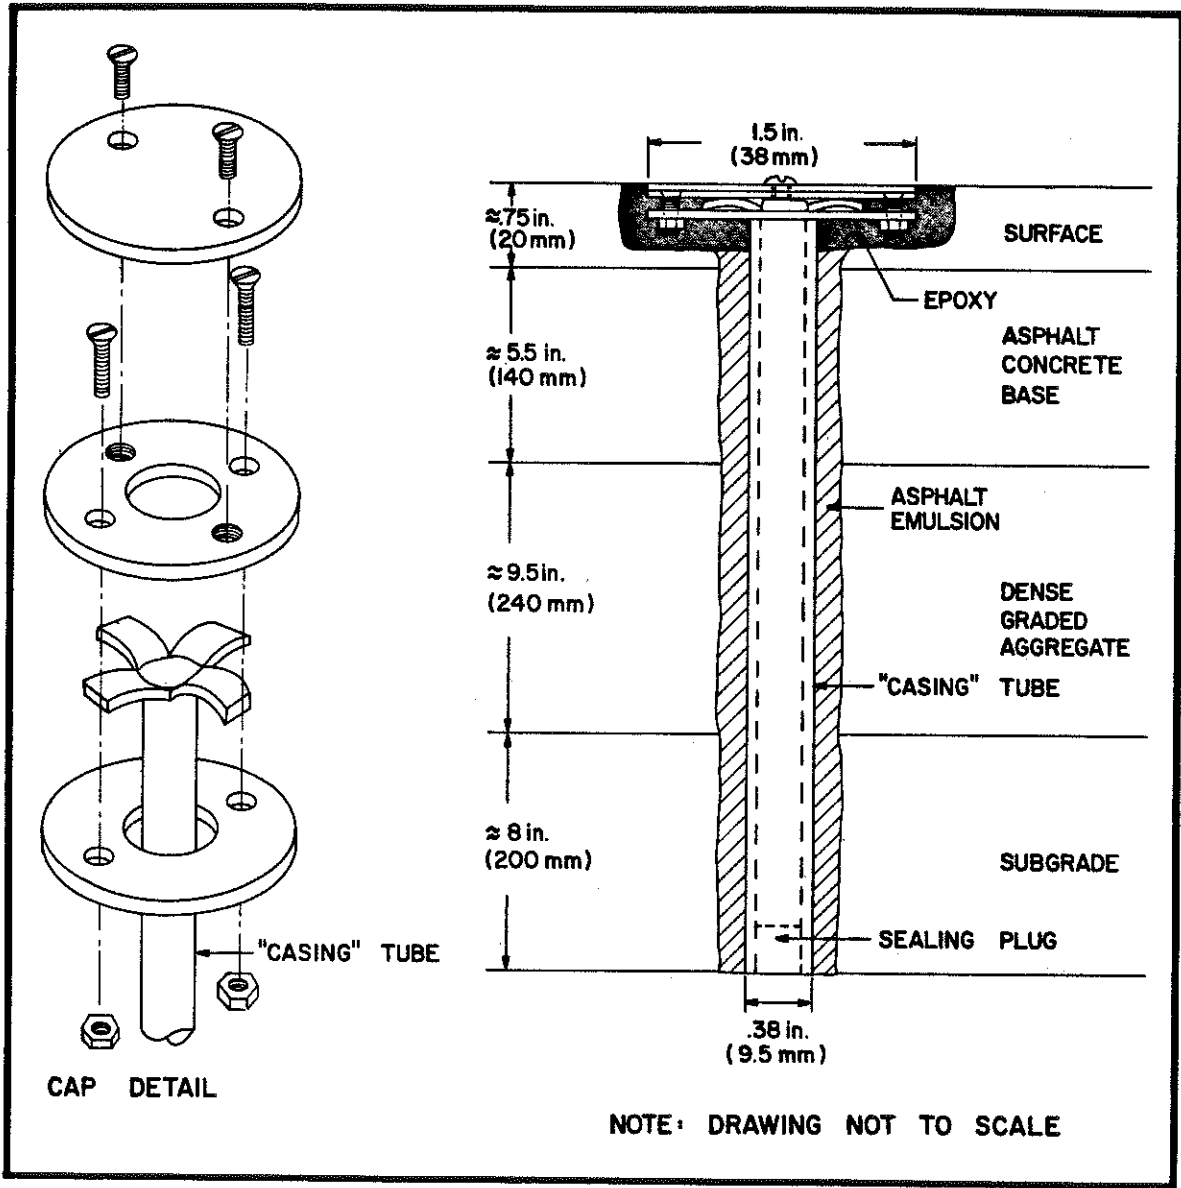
Cap Detail for "Casing" Tube and a Typical Installation of "Casing" Tube.
